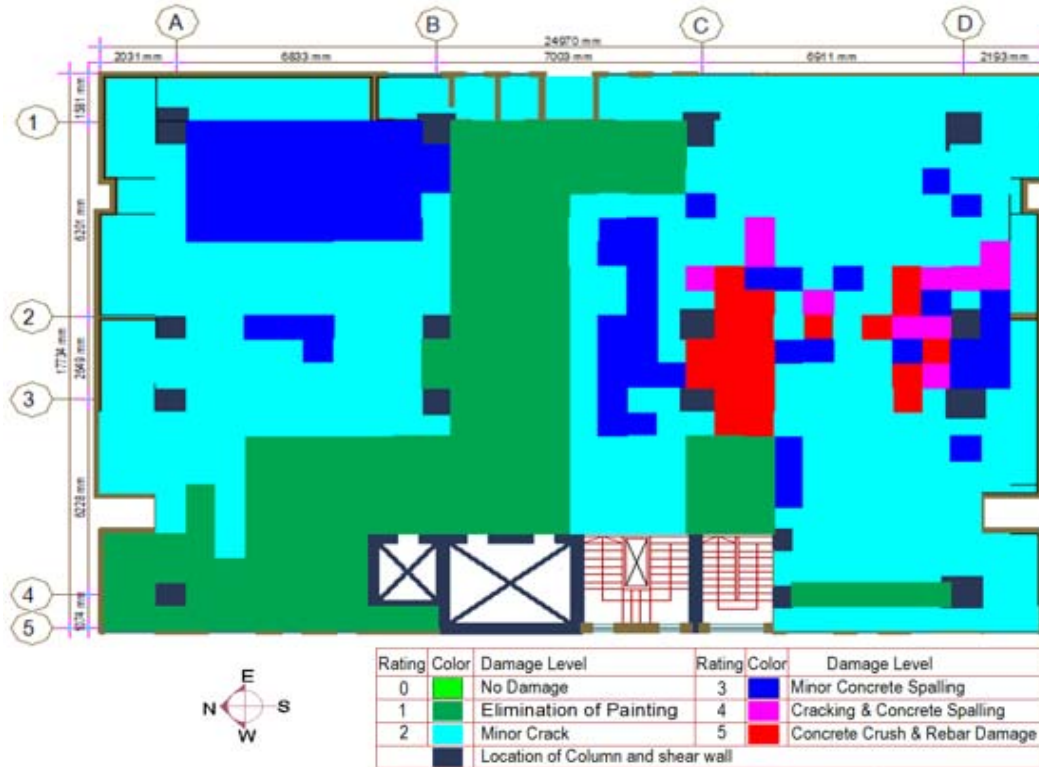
Column and slab subdivided into 900mm X 900mm.
